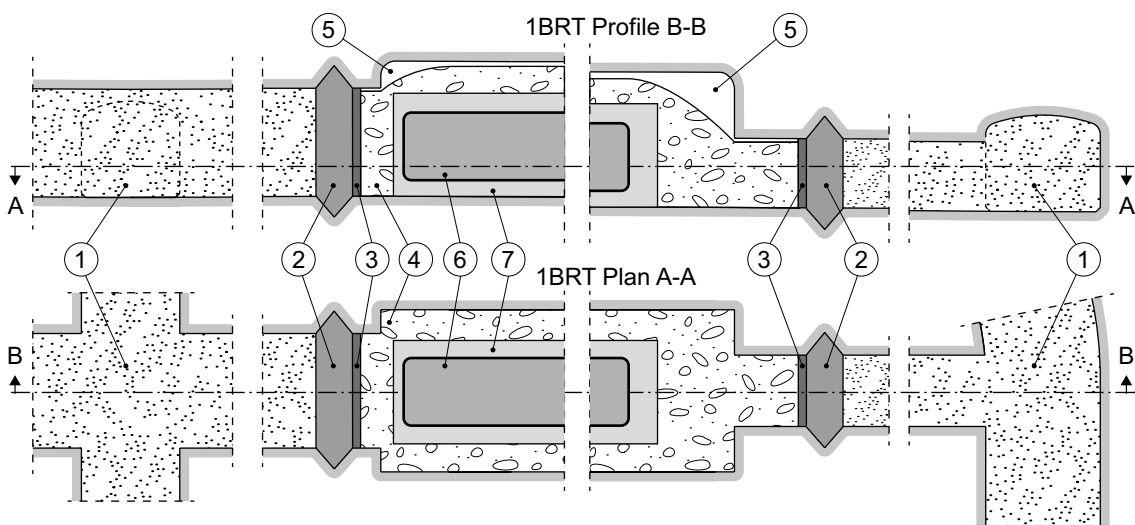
Schematic profile and plan of BRT after closure. Key to numbering: 1) Bentonite 2) Concrete plug 3) Supporting wall and mould for casting 4) Macadam 5) Open gap between macadam and tunnel roof 6) Reactor pressure vessel filled with concrete 7) Concrete casting.
